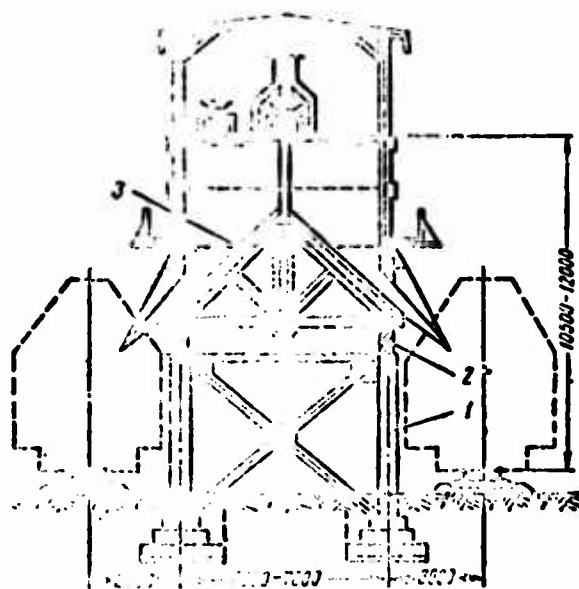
The diagram of a wooden-reinforced concrete double-sided hopper with lateral unloading.
